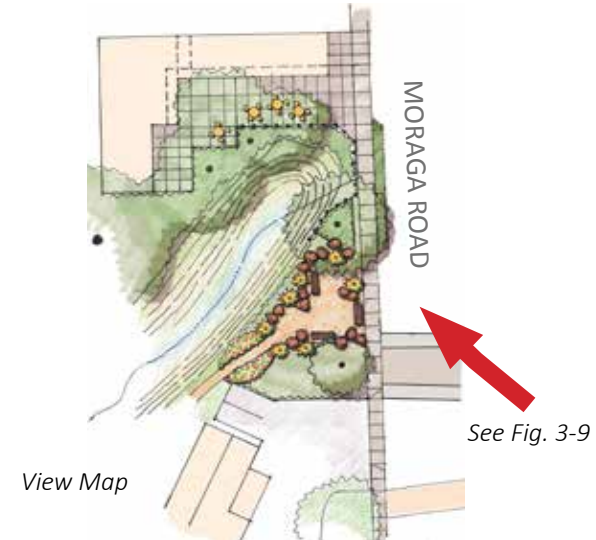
Plan View - Sidewalk creek overlook with rain gardens, creek icon, signage and decorative fencing
